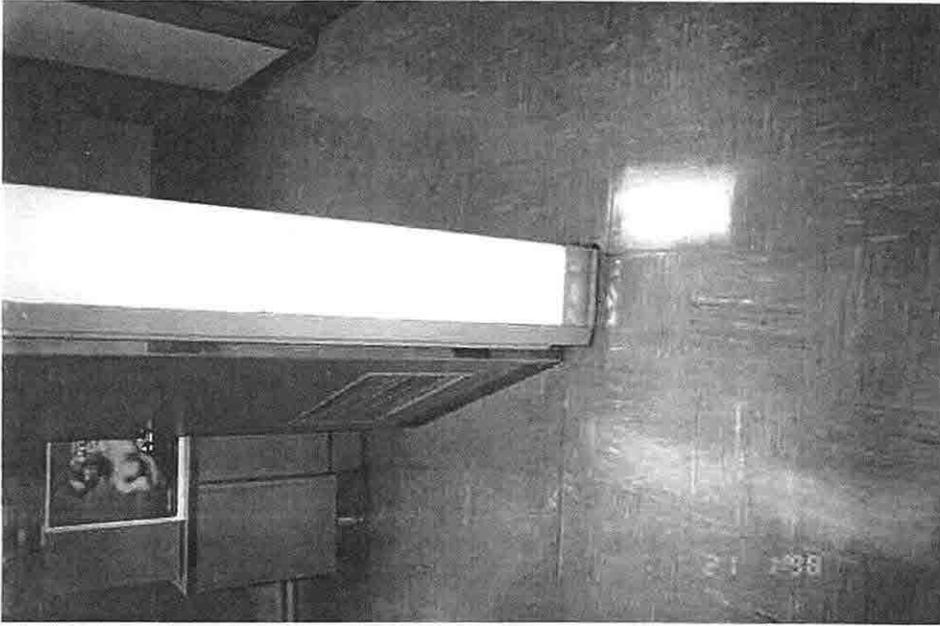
3rd Floor Level, Roof for the 2nd Floor, Viewing East
